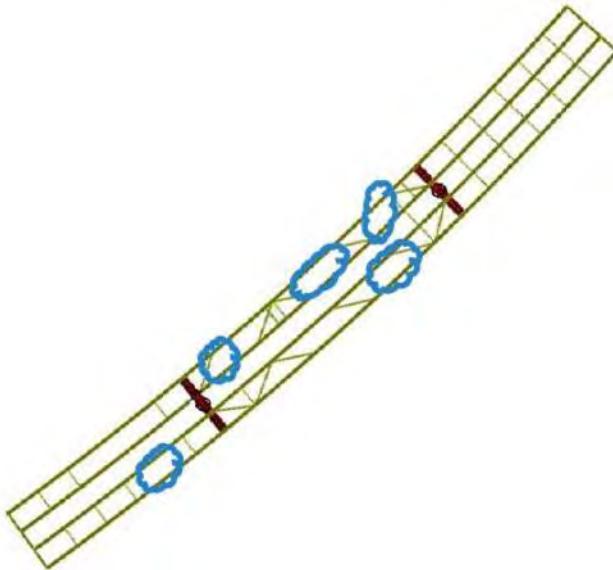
Framing plan of remaining members after first elastic hinge on girder B at  $0.03 \times HL-93$  (Deck not shown for clarity)
